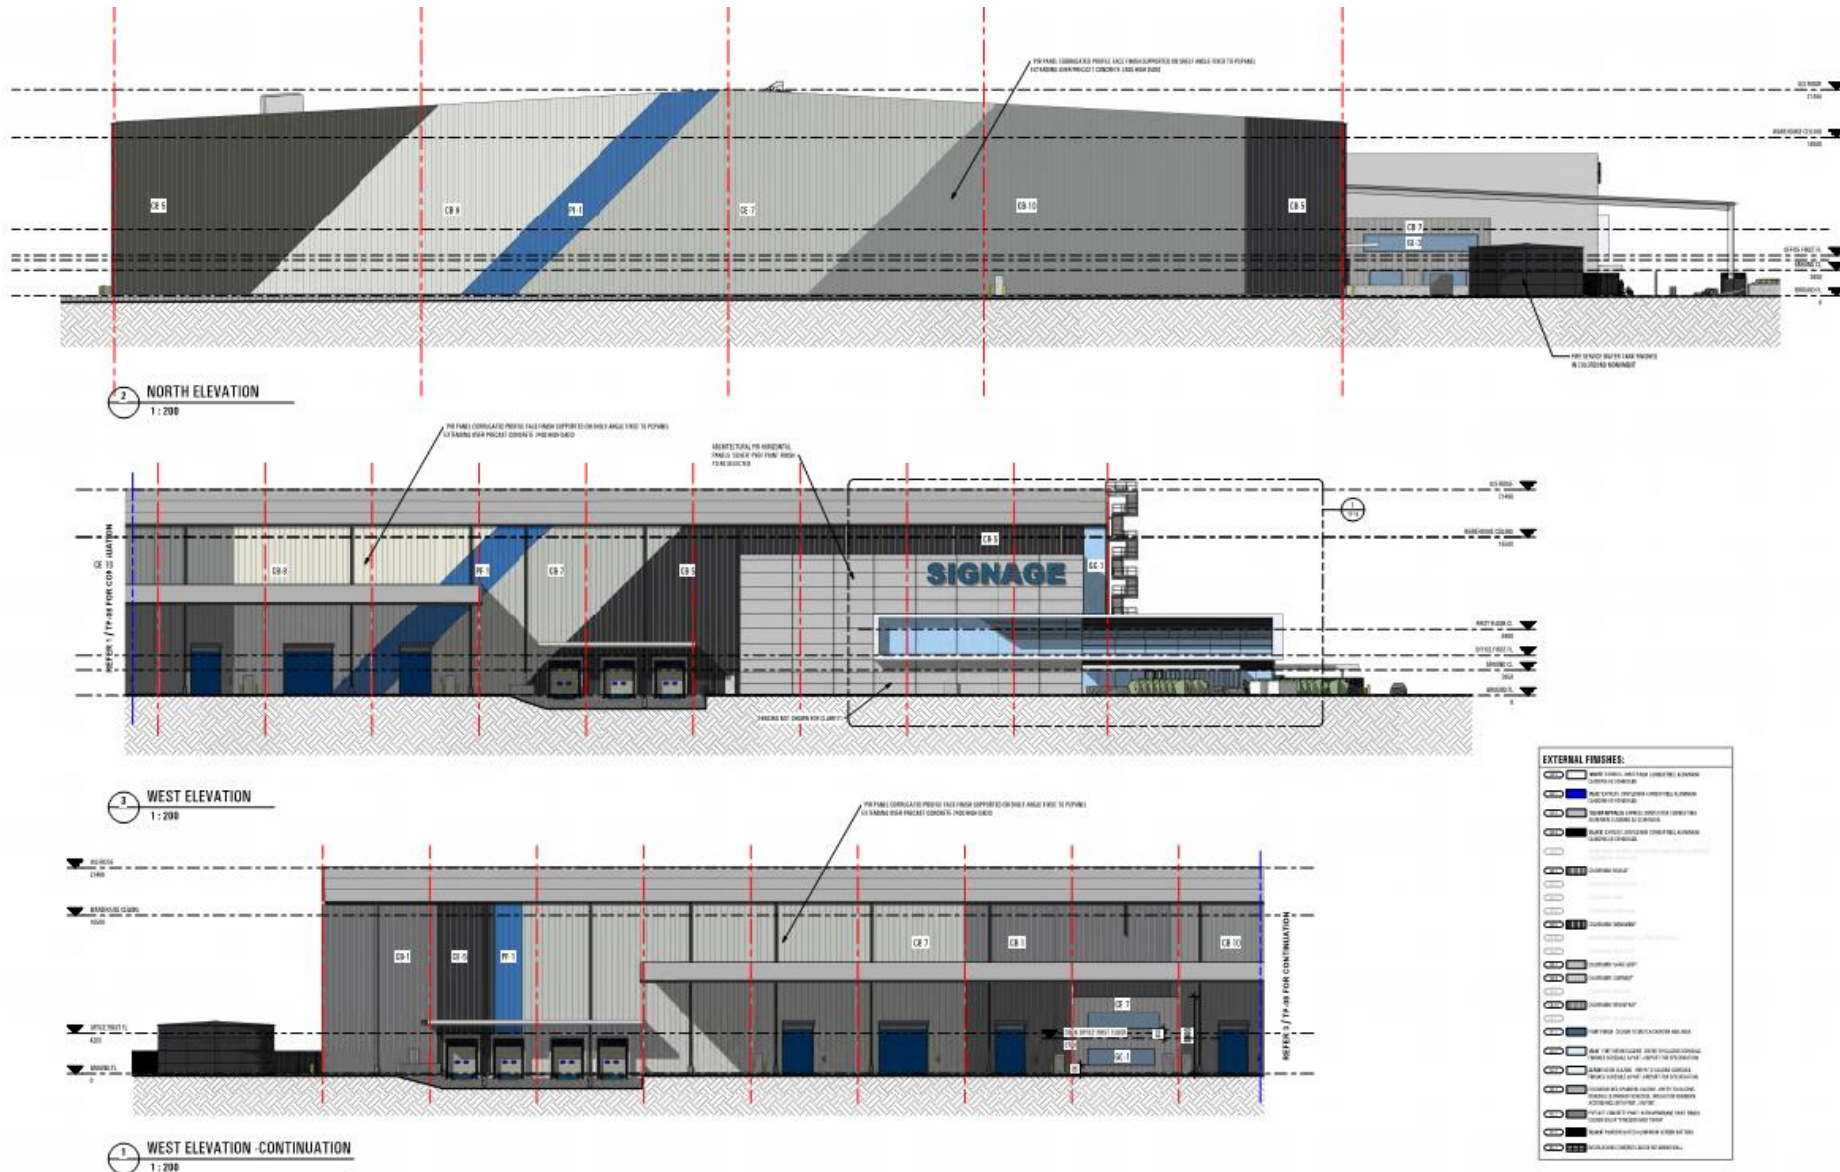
Proposed Elevations (Source: Qanstruct, 2022)
